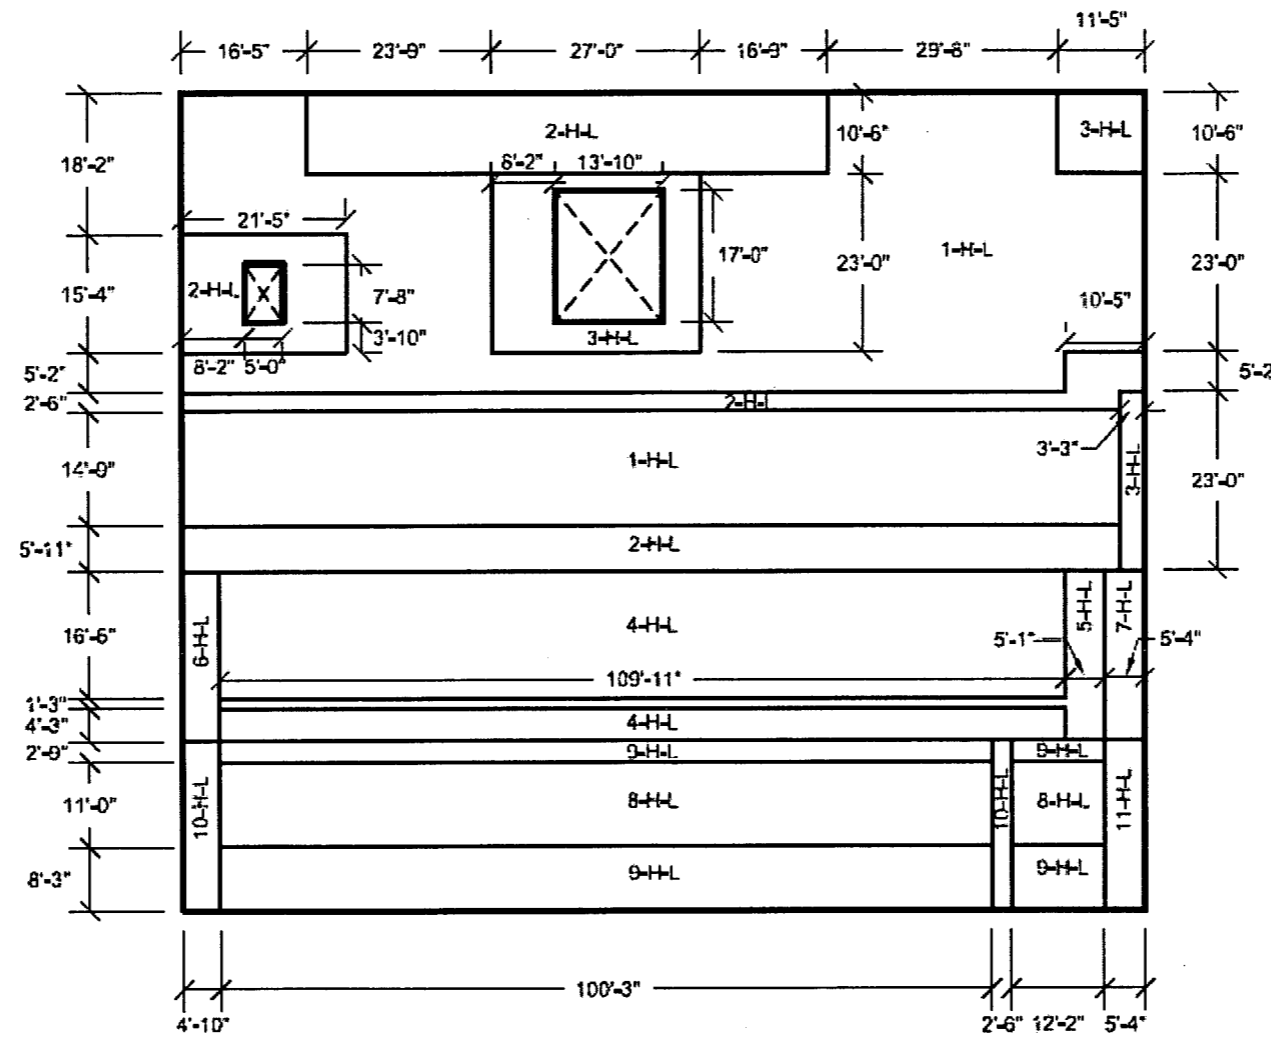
H.3-15: SOUTH WALL LOOKING NORTH
